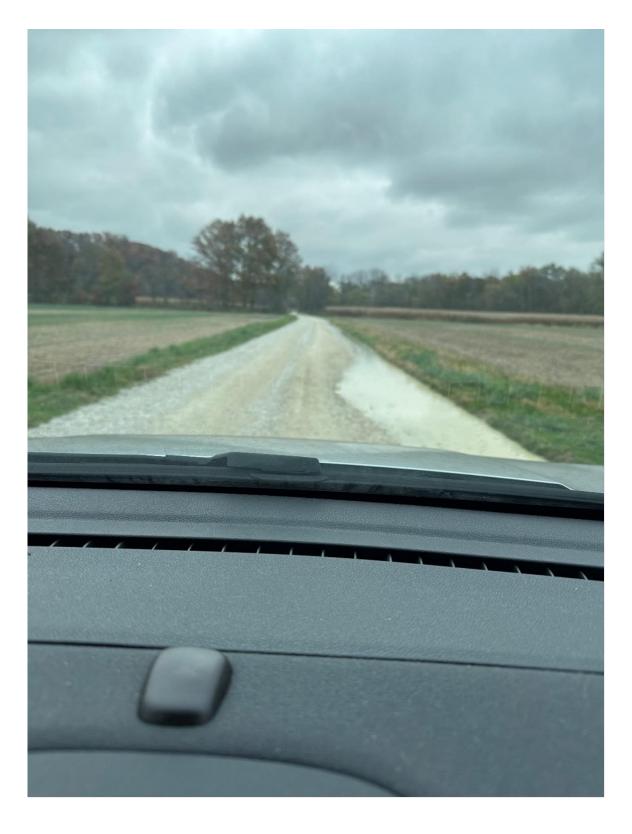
Traveling north along N Maple Grove Road from W Delap Road
